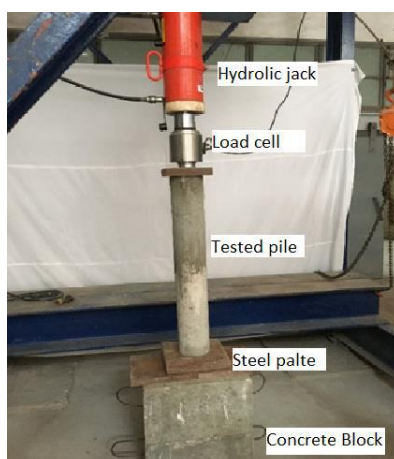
Testing machine set-up and concentrically loading of the tested pile.
